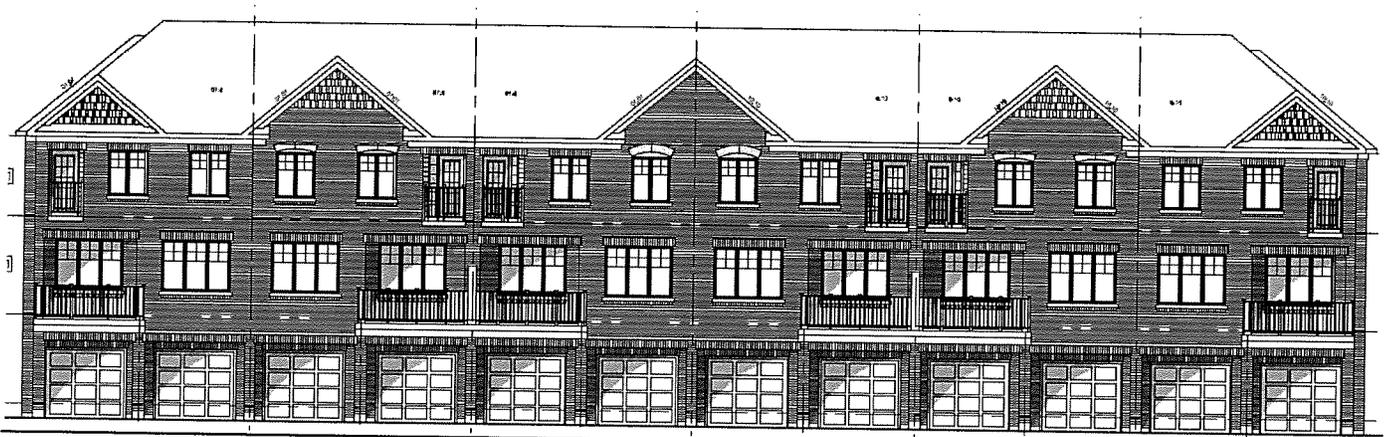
Conceptual Elevations (Sheet 5 of 6)
